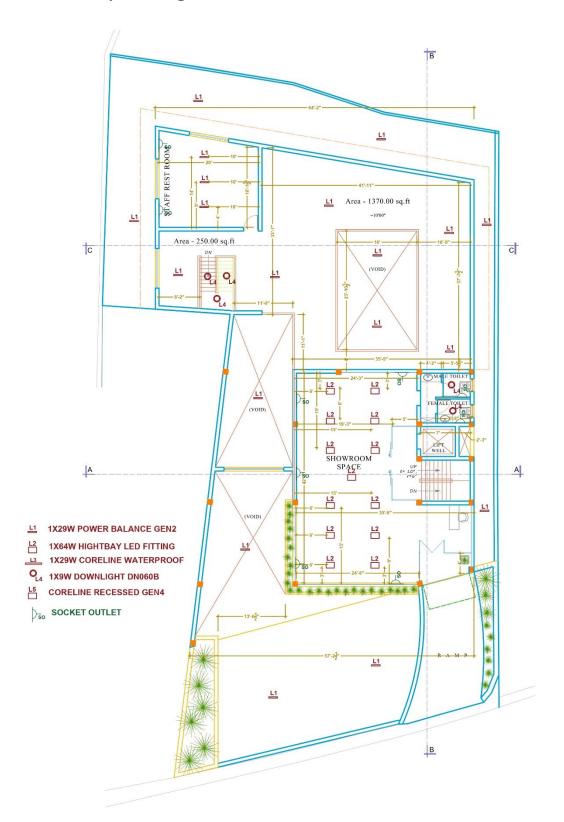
Electrical Layout Diagram for Mezzanine Floor
